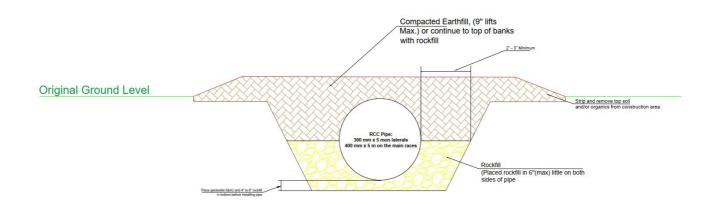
Cross section of proposed crossing. (Source: FNSF, 2022).
